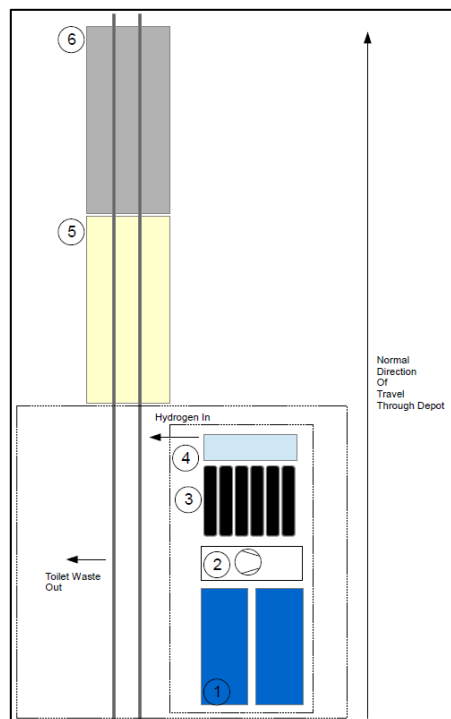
Schematic of proposed layout for H<sub>2</sub> refuelling station at St Erth.
